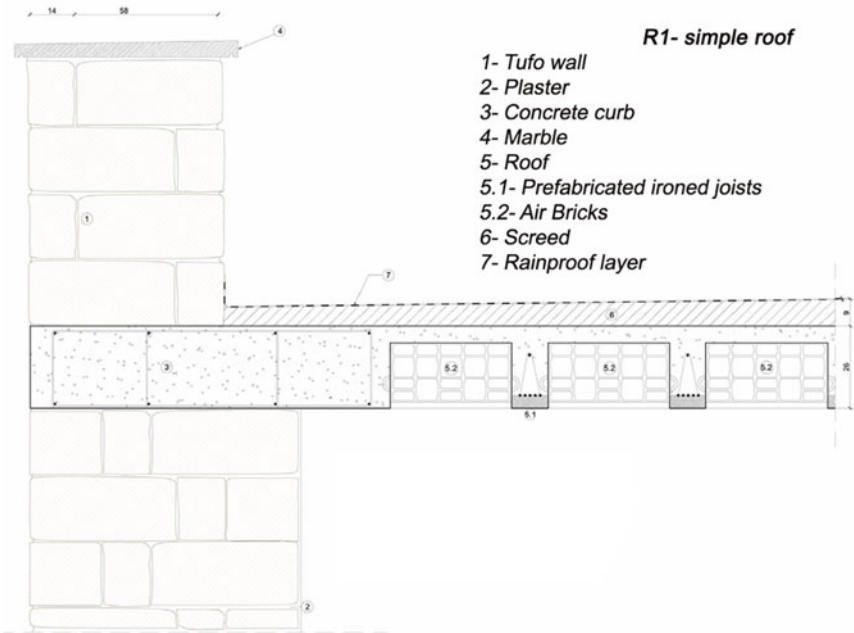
The roof assembly tagged R1 (waterproofed concrete roof)
